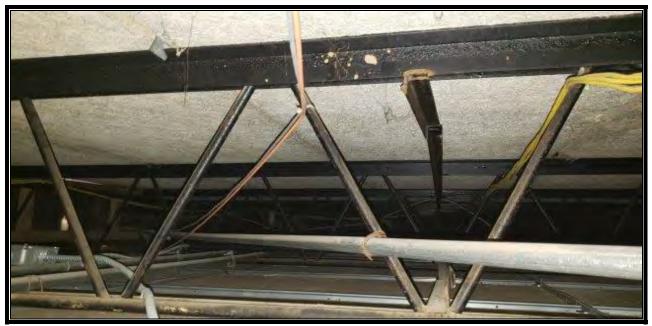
Non-ACM and Tectum Ceiling (Tan/Gray)
